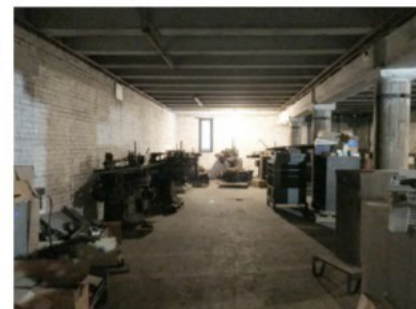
Depth of Floor Girders Dividing Floors into "bays"
